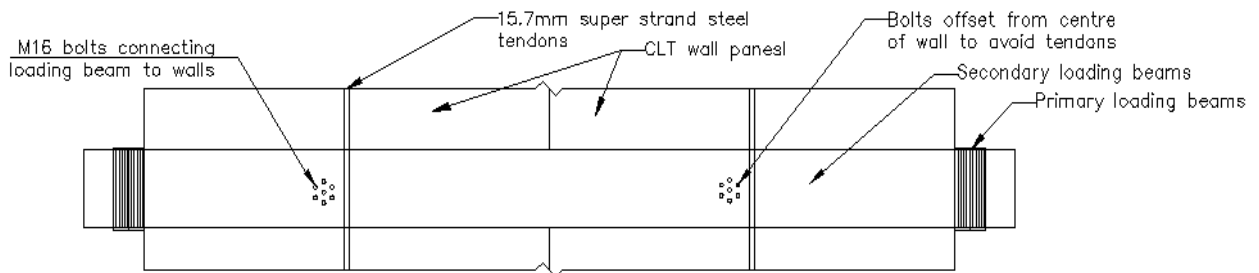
Bolted 'pin' connection between loading beams and the post-tensioned walls
